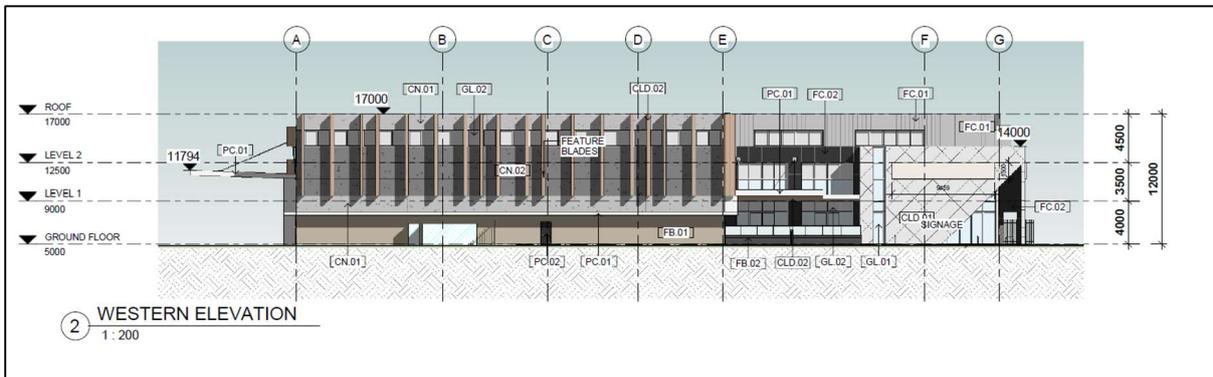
Western Elevation. Source: EJE Architecture (May 2024)
